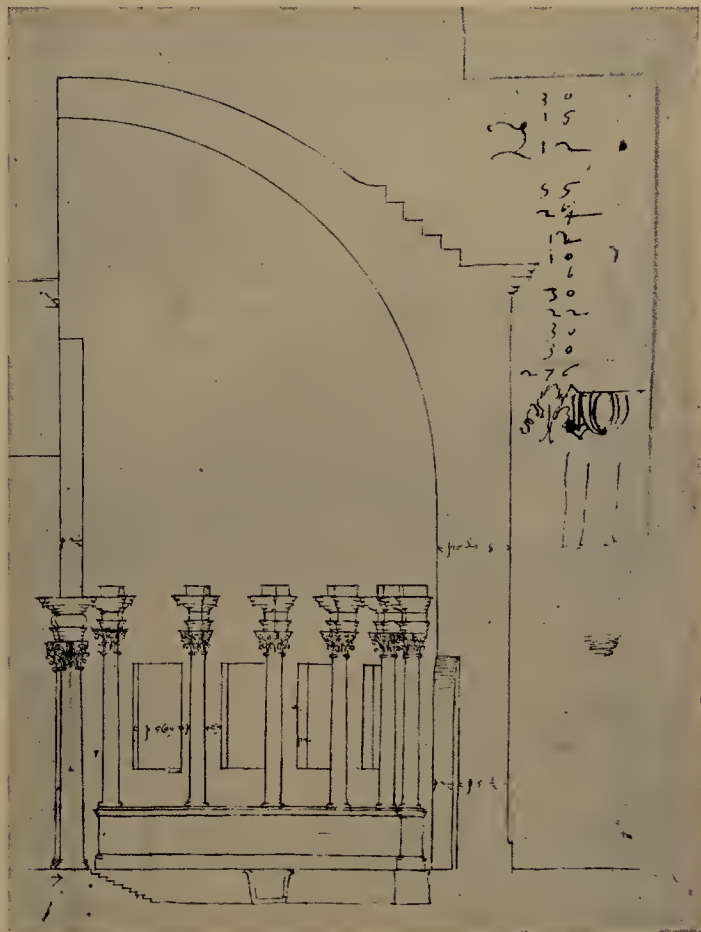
Palladio's elevation of the Thermae of Trajan. (From the *Burlington-Devonshire Collection*, vol. iv, sheet 5)
